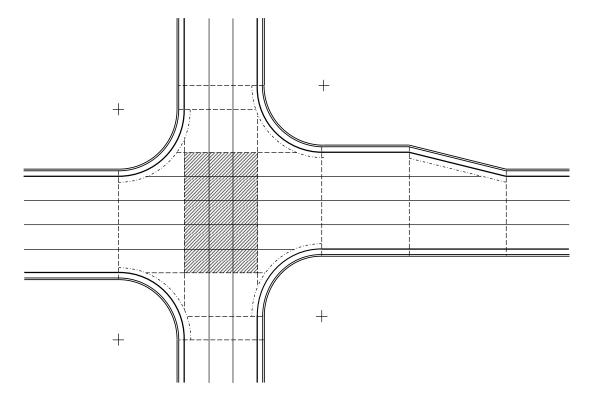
Typical Joint Layout for a Rigid Pavement Intersection (Shows Lane Configuration, Step 4)
